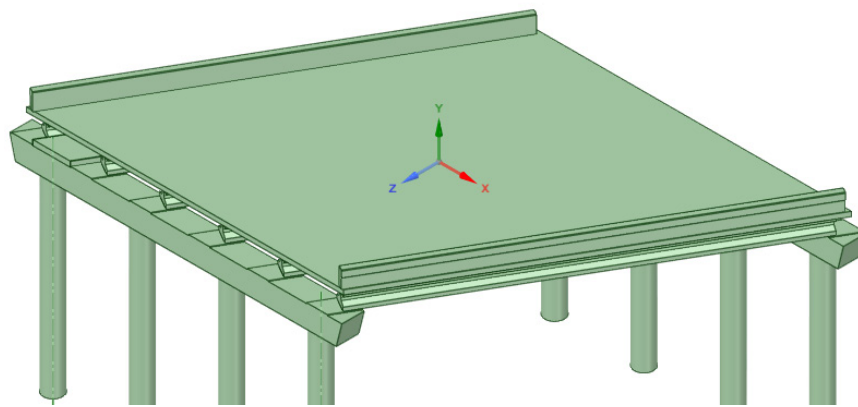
30-degree skew, 44-ft roadway TX28 I-girder bridge
